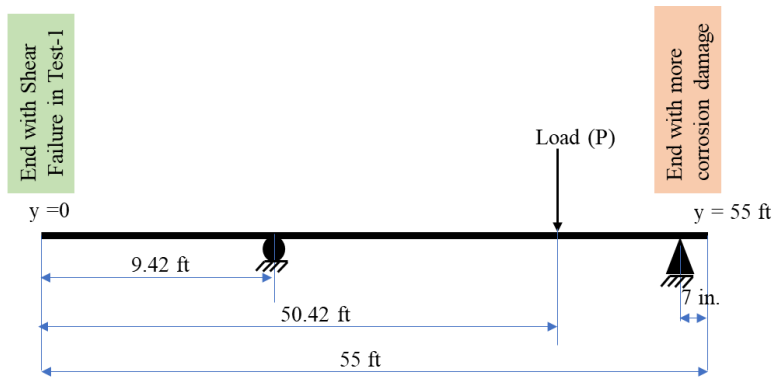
Test Setup in Test-2 on Aden Road Bridge Box Beam-3
